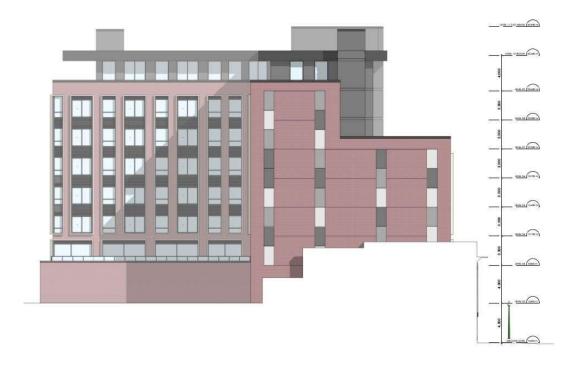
Building East Elevation / Figure 4.2.4 Building West Elevation
